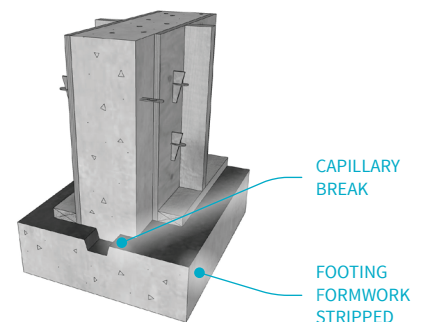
"Best practice" formwork with footing and foundation wall concrete placed separately and waterstop/capillary break installed.
